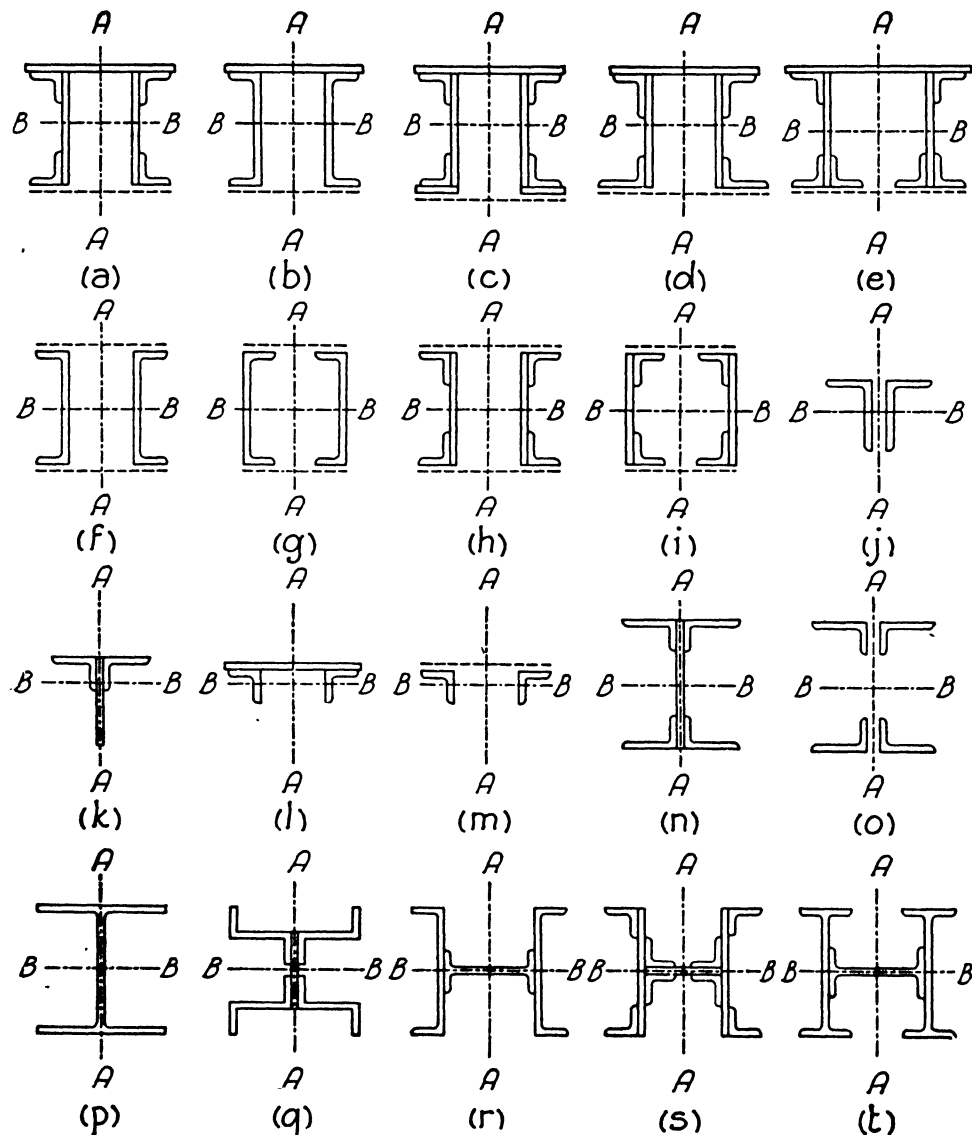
TYPES OF COLUMNS AND TOP CHORD SECTIONS.
